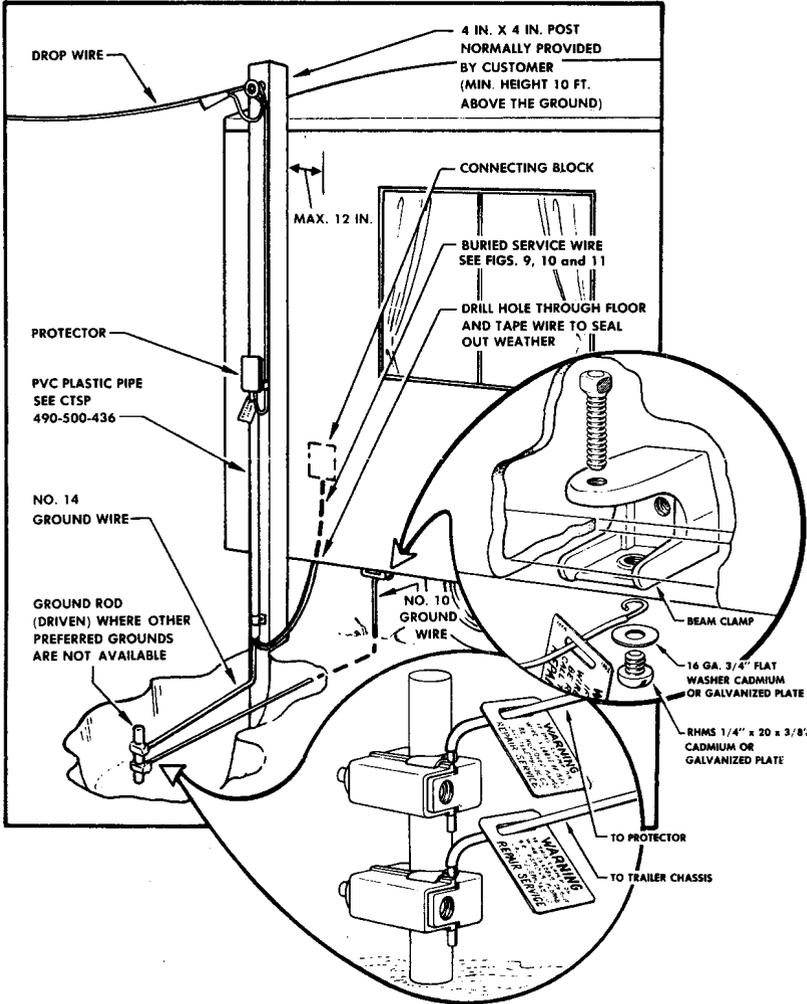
Typical Installation—Aerial Distribution, Ground Rod Ground
